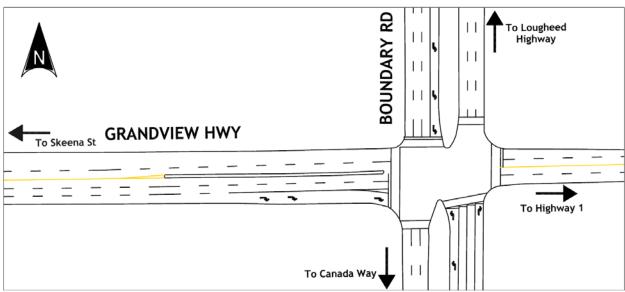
Grandview Highway and Boundary Road - Existing Conditions
